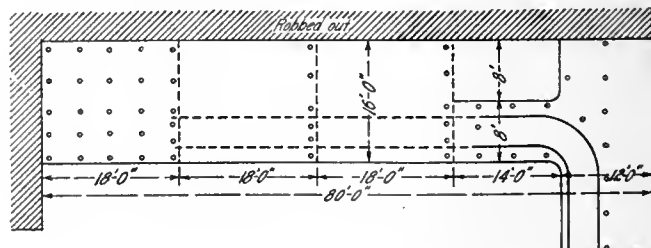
POSTING AND SIZE OF FALLS IN 80-FOOT CENTER ROOMS
